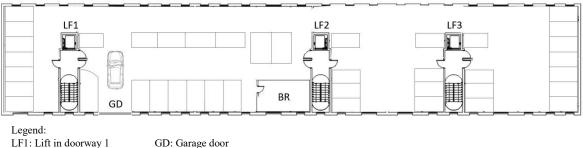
Plan layout of the building. Pattern plant: 1st to 5th floors.
